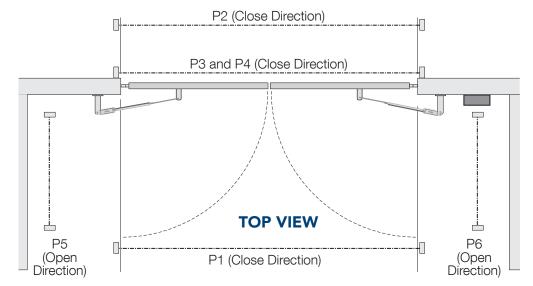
POSSIBLE ENTRAPMENT ZONES AND PHOTO EYE LOCATIONS (TOP VIEW)
